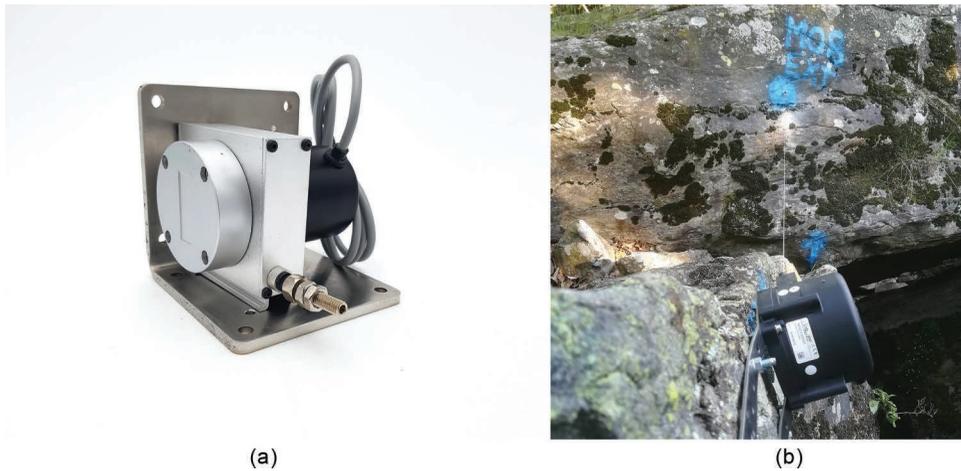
Type of surface extensometer and example of installation on a rock slope above a tunnel under construction for stability monitoring. (Courtesy of Gestecno S.r.l. and GD Test S.r.l.)
